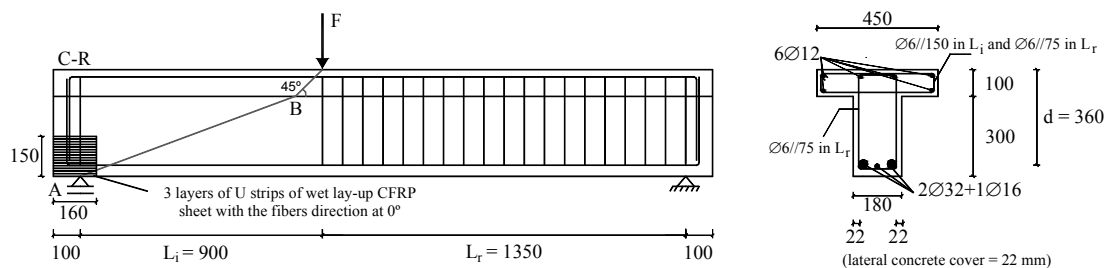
Reinforced concrete T reference beam: geometry, support, steel reinforcement scheme and loading conditions [dimensions in mm] (Dias and Barros 2010).
